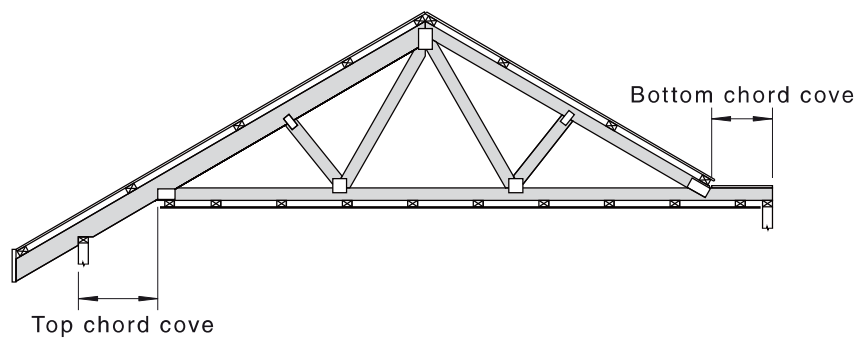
(in part) ROOF TRUSS AND SYSTEM TERMINOLOGY
